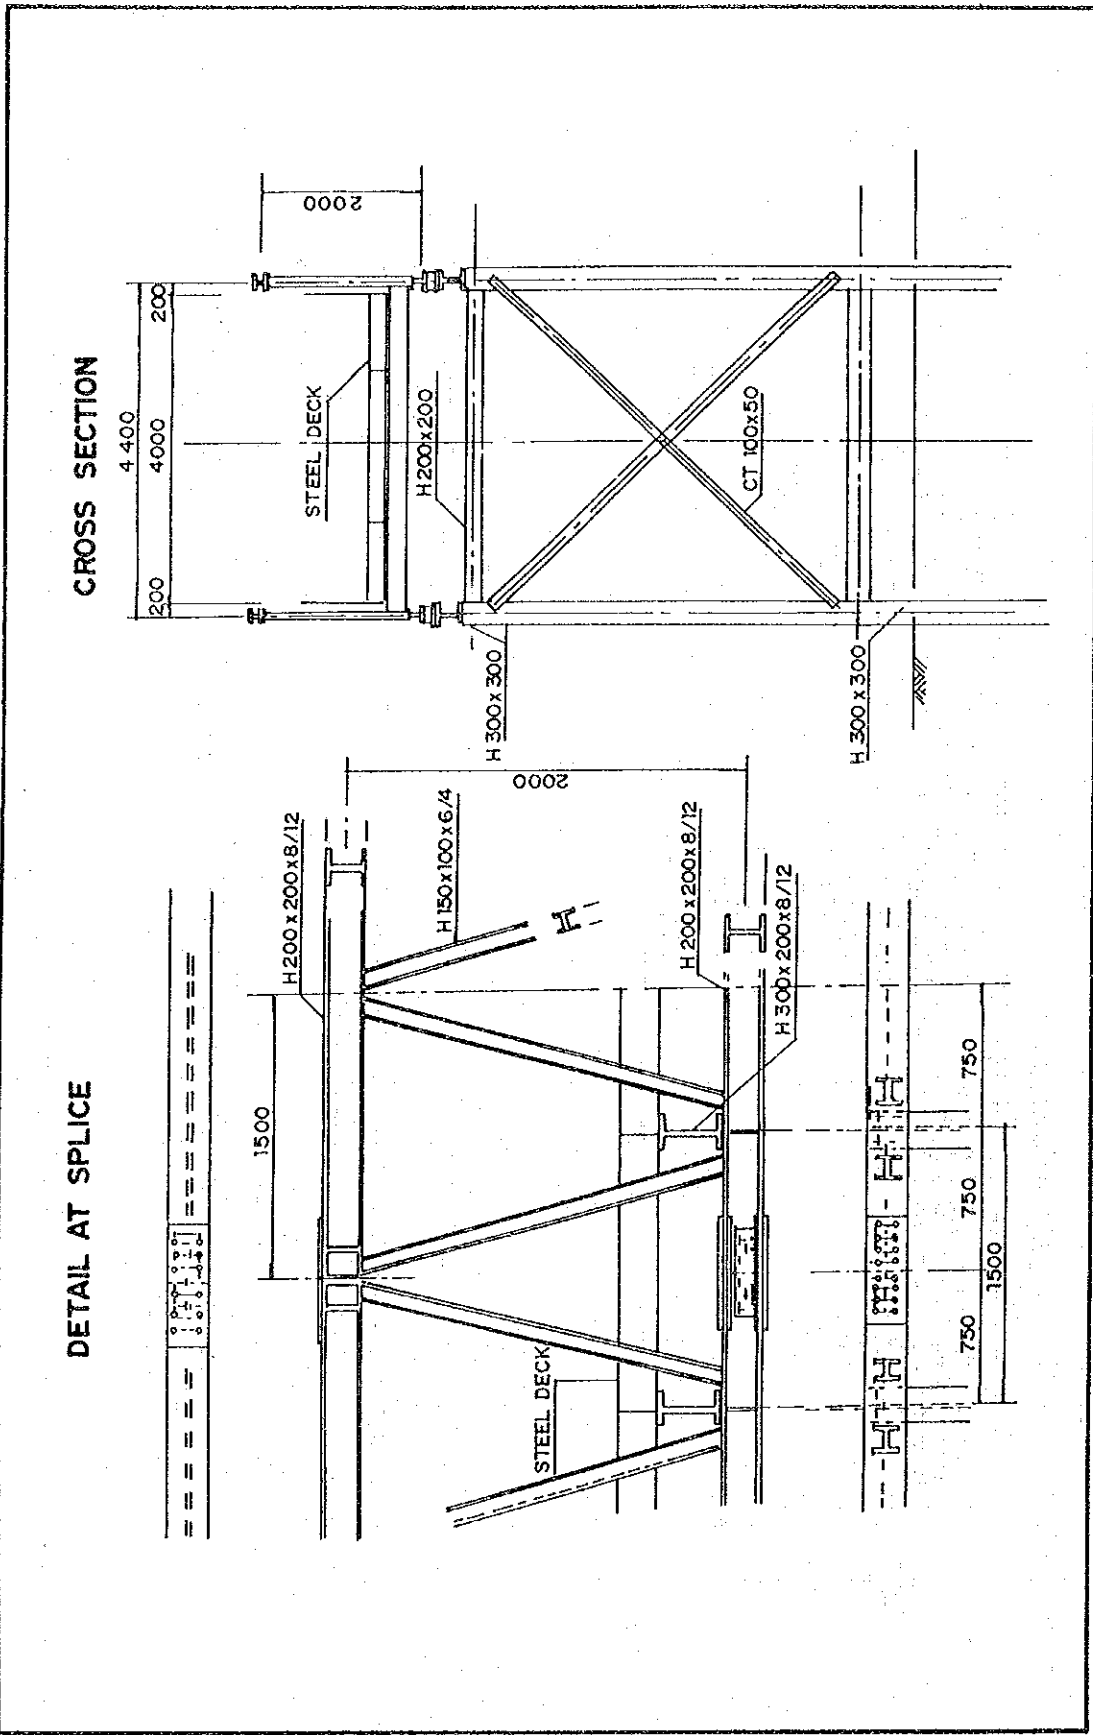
(2) PORTABLE BRIDGE
